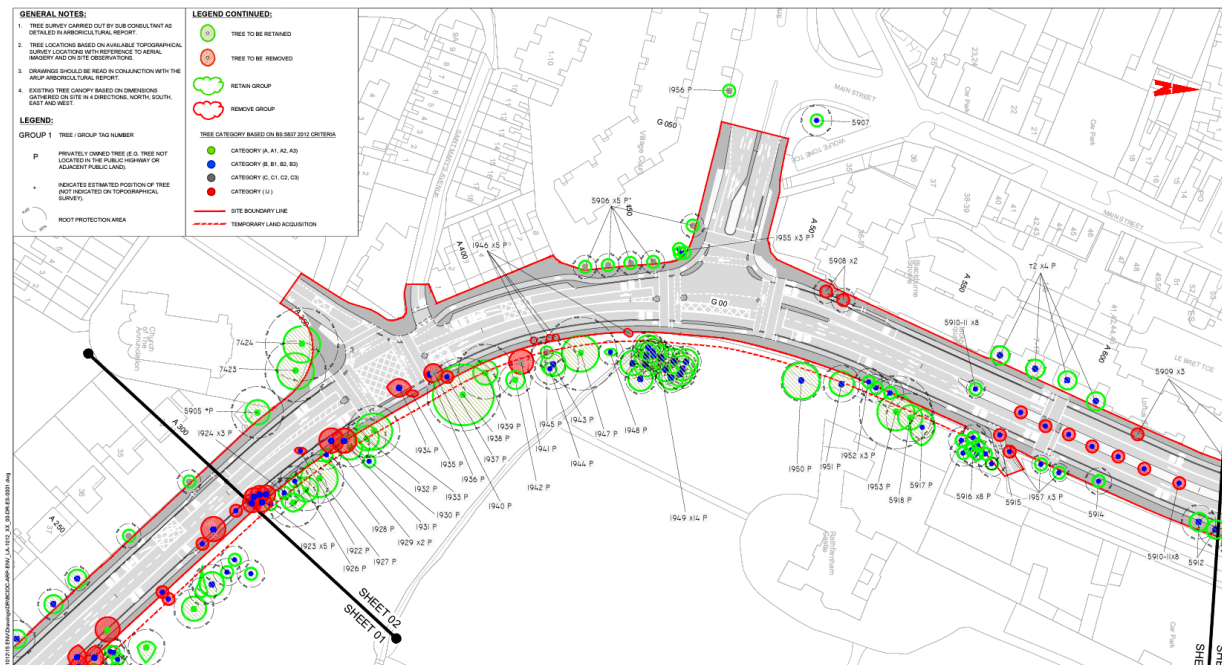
Extract from Tree Protection Plan in EIAR Appendix A17.1 (Sheet 02)
